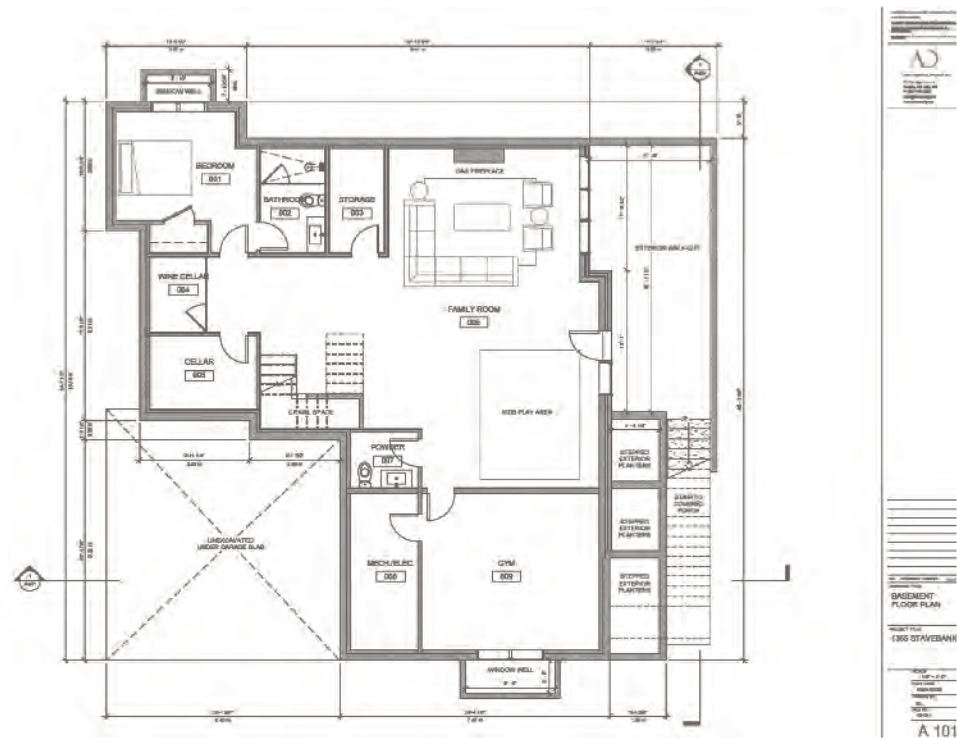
Proposed Basement Floor Plan (AEON Design Studio, Inc., 2019)
